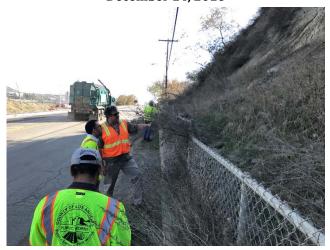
Frontage Retaining Wall on San Fernando Road: December 14, 2016
